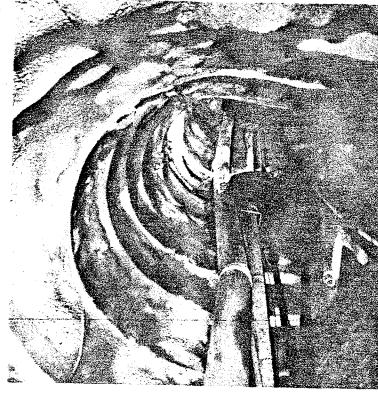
The tunnel shown in Fig. 3 successfully reconstructed by reviving the deformed portion in steel and strengthening it by shotcrete
